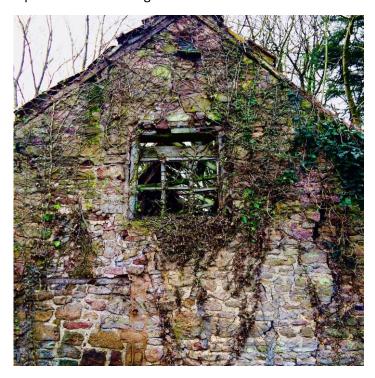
Original stonework & roof tiles of the Folly barn, before its partial collapse.
